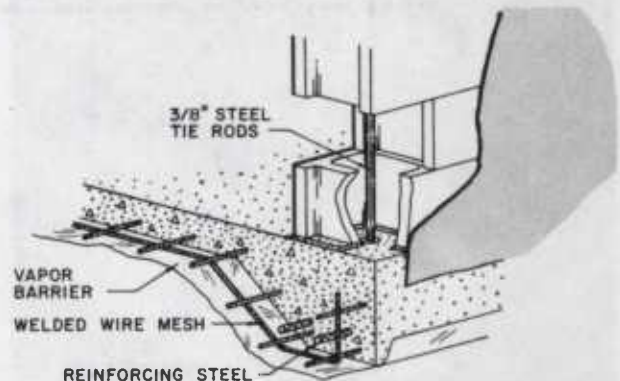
Concrete slab floor on grade. Install bolts for tie-down rods.
